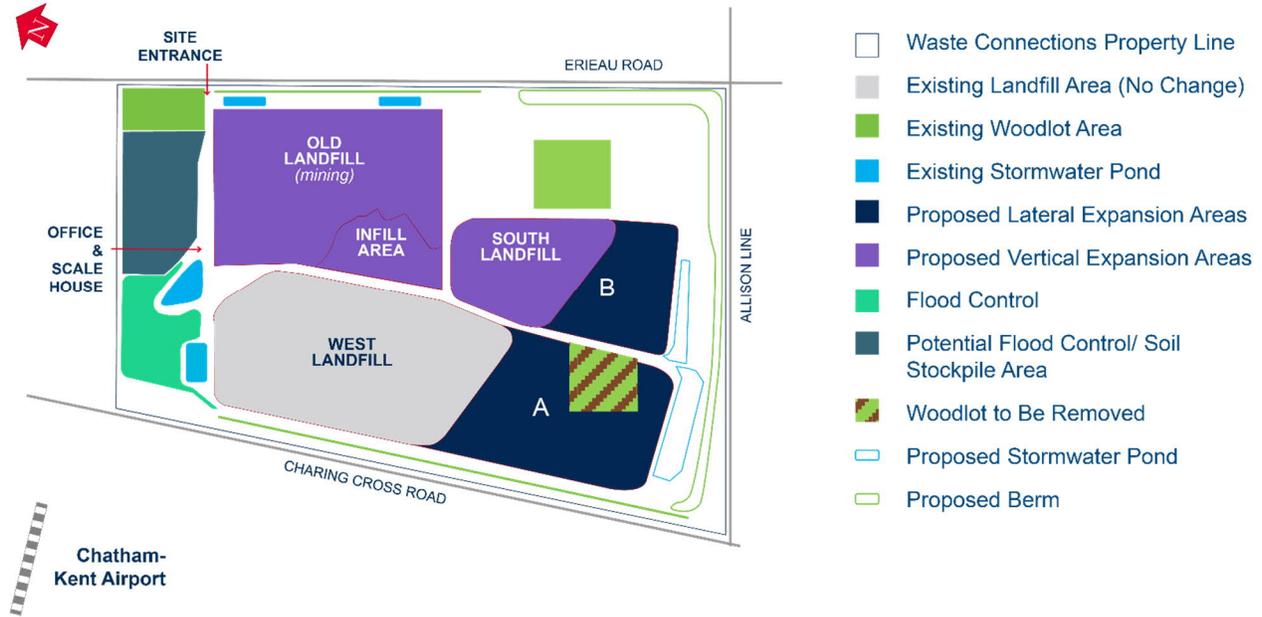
SITE DEVELOPMENT – ALTERNATIVE 1
